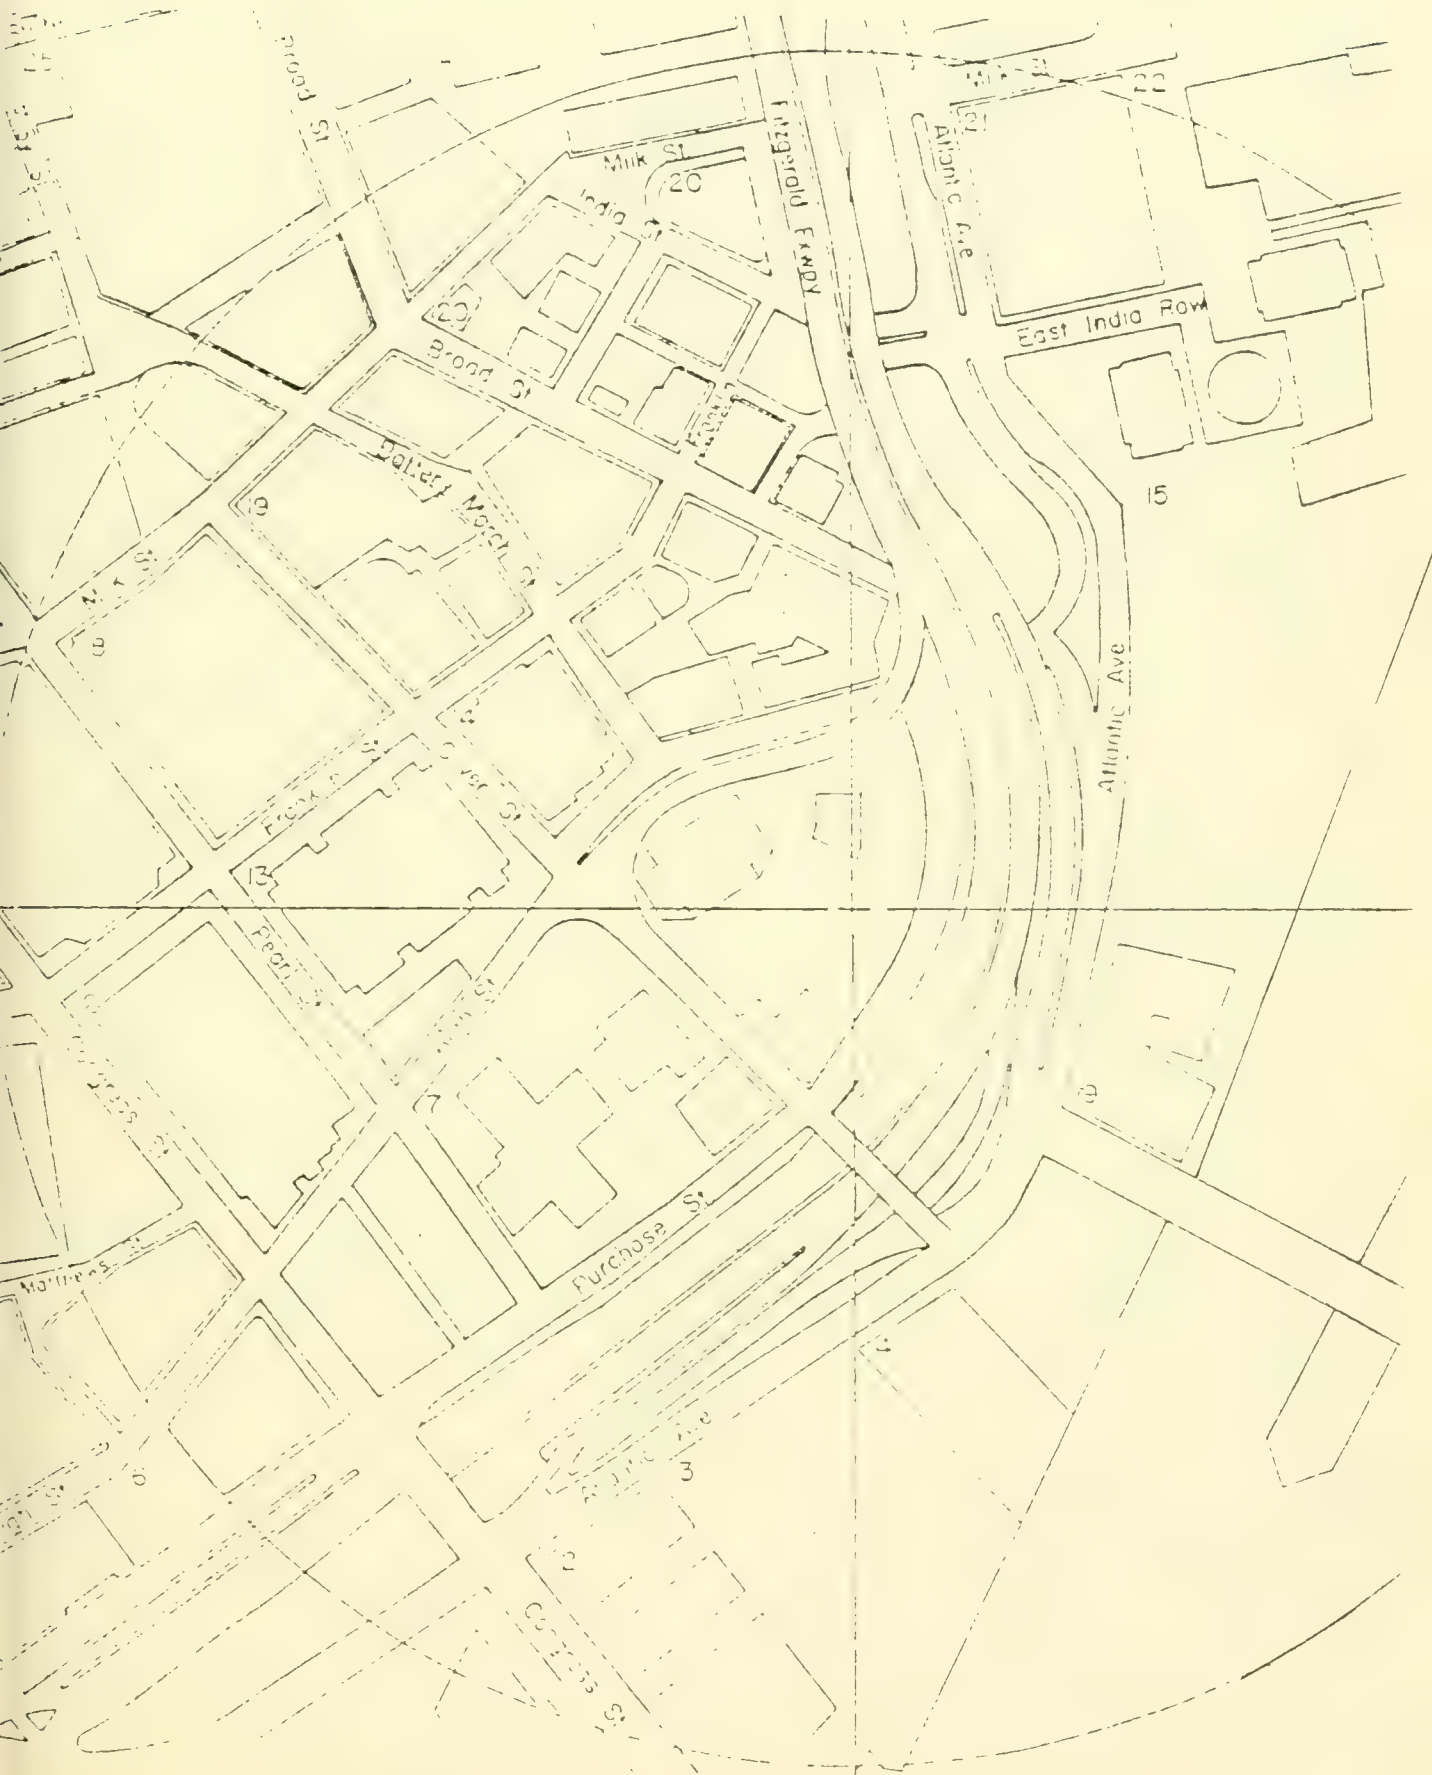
Site Configuration PH1 - South Tower and Lowrise
